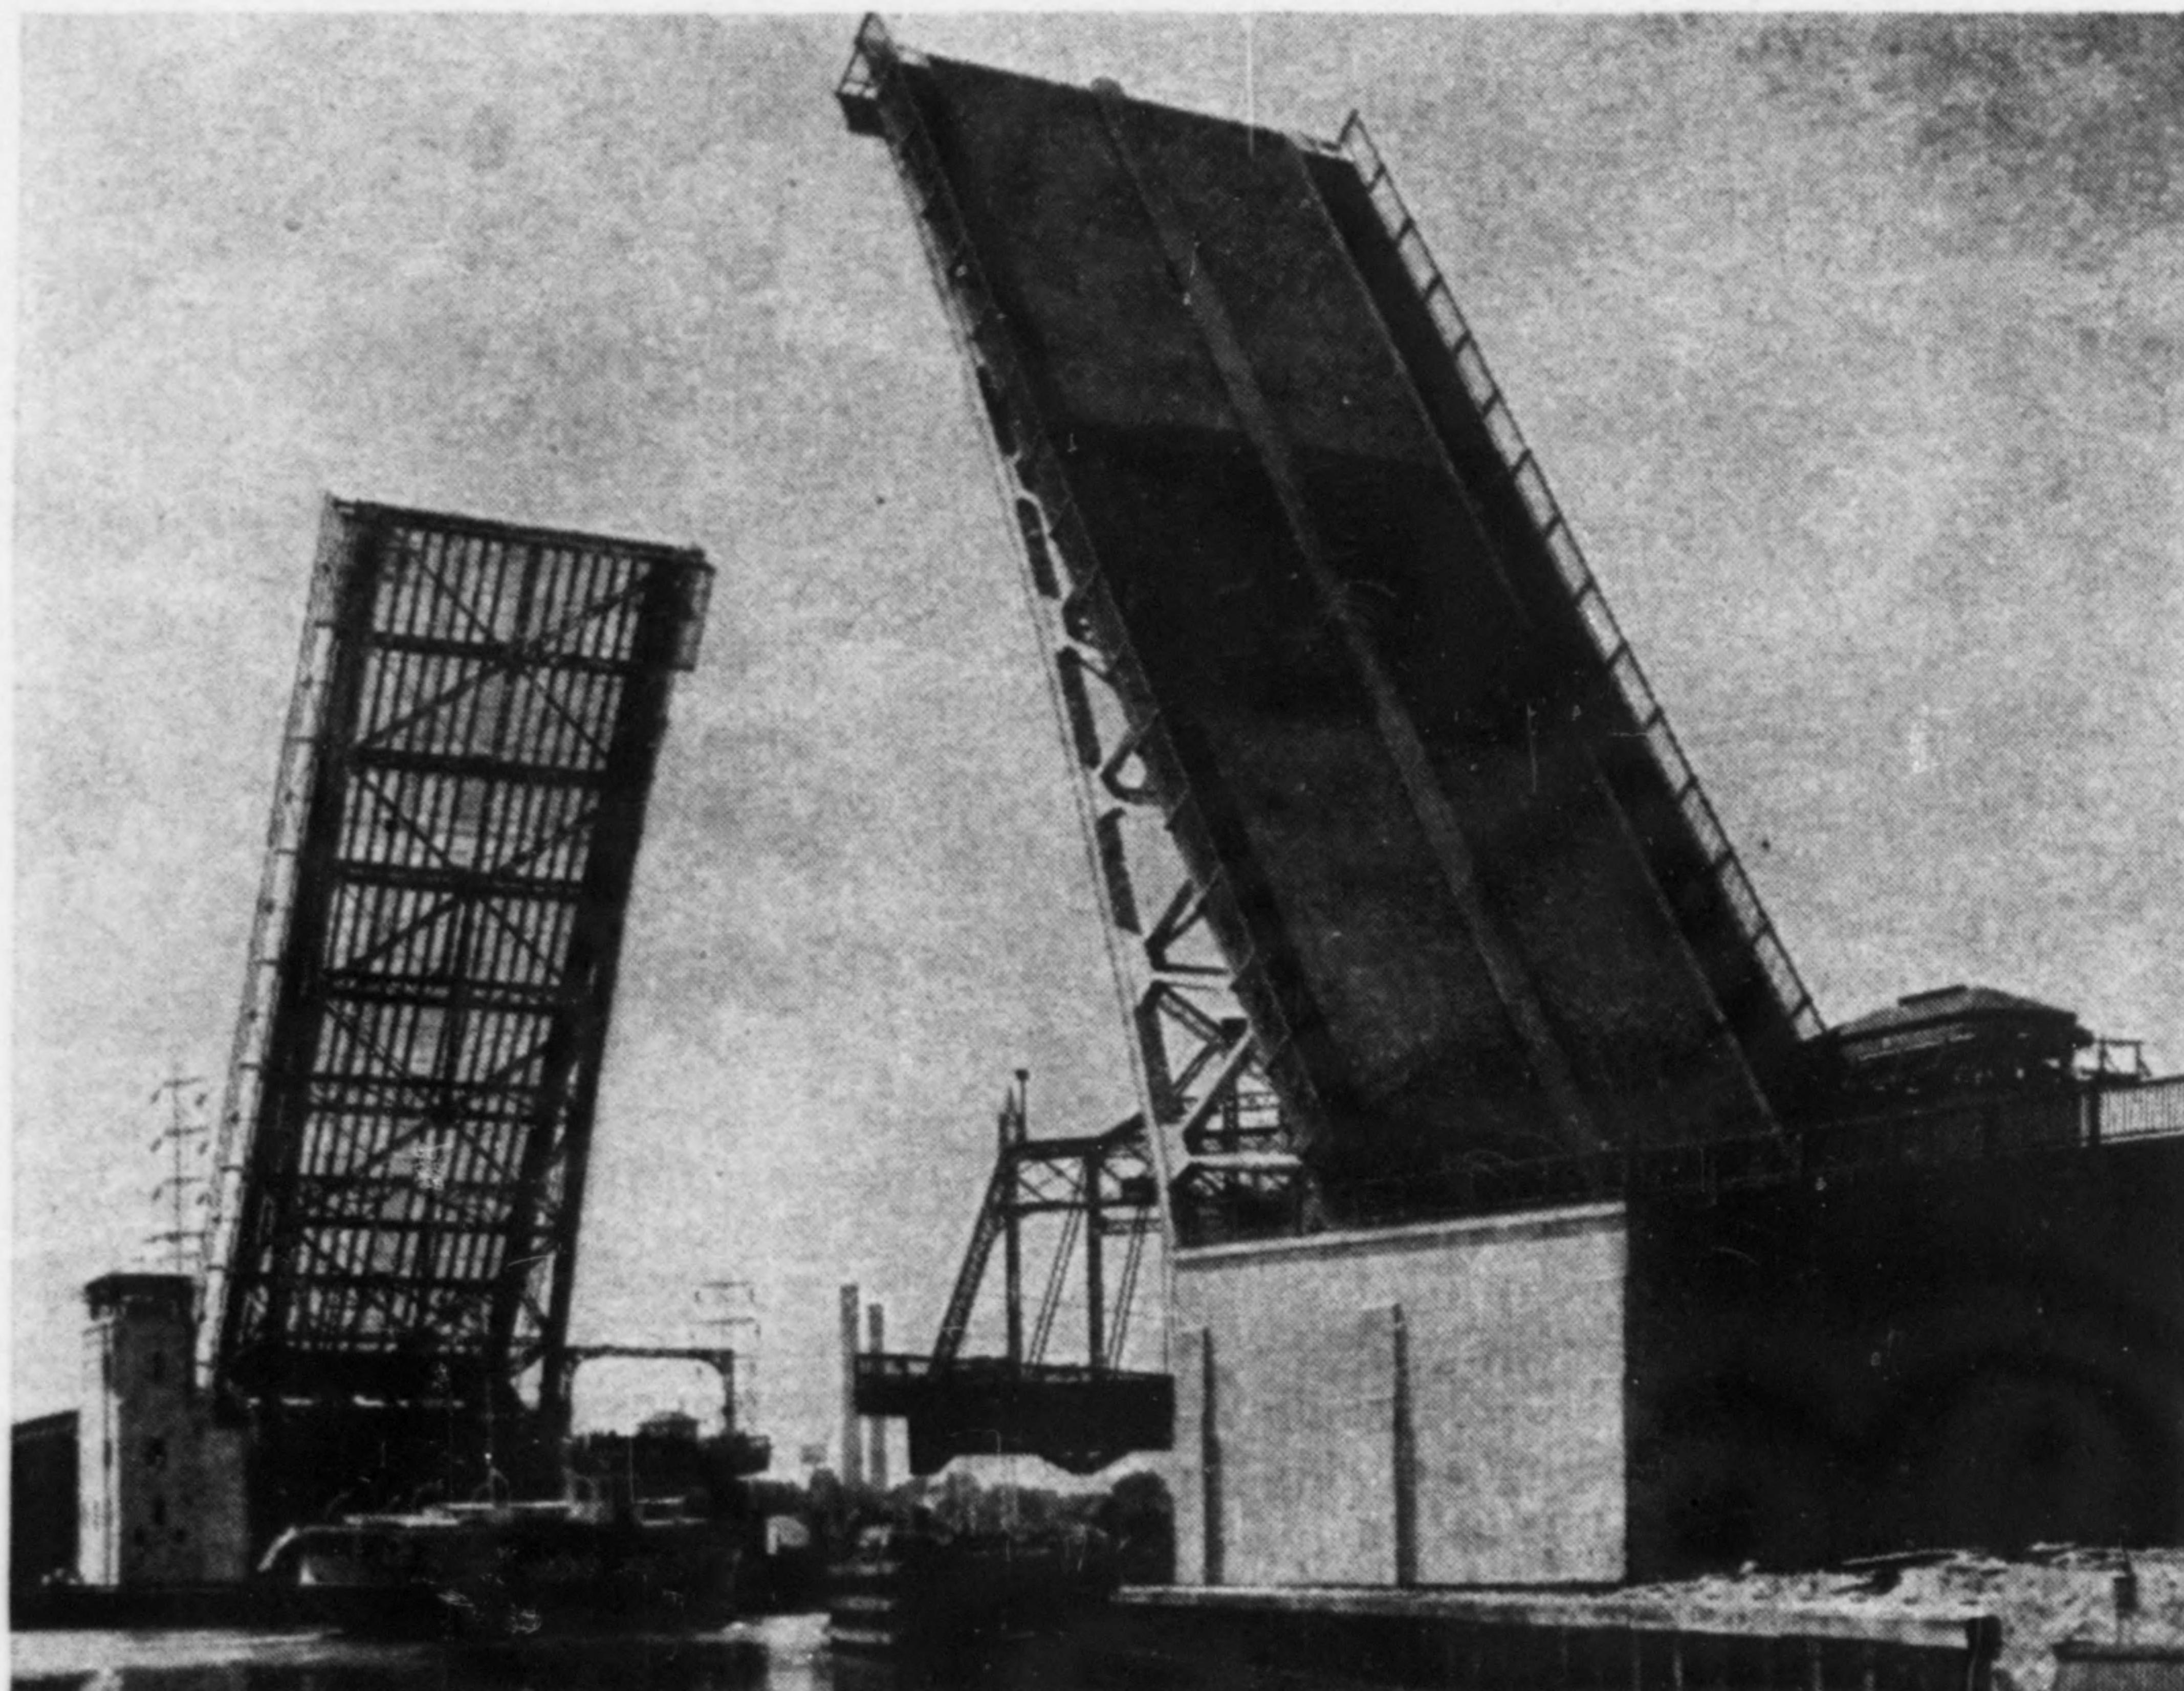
How the long bascule with open-grid steel deck looked when completed. Old swing bridge adjacent is not being removed.
